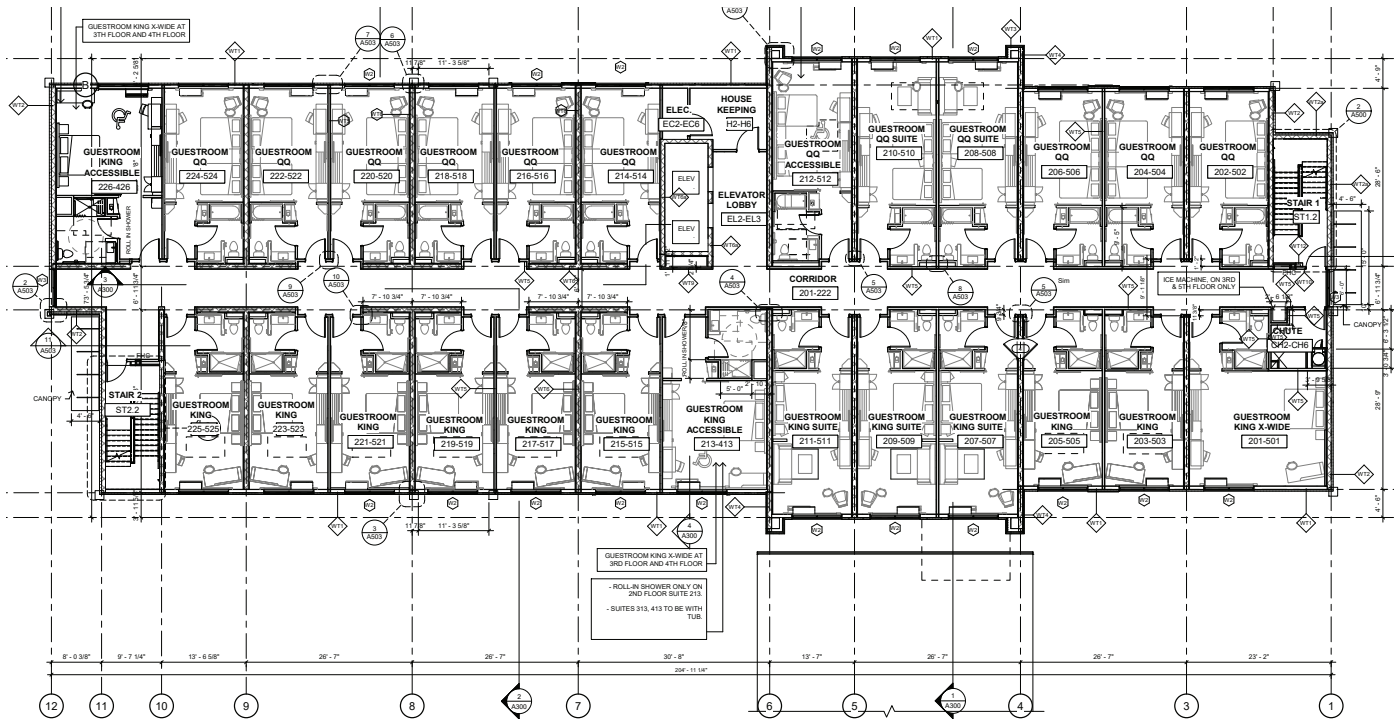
Proposed 2nd to 4th floor plan. Courtesy of Chamberlain Architectural Services
